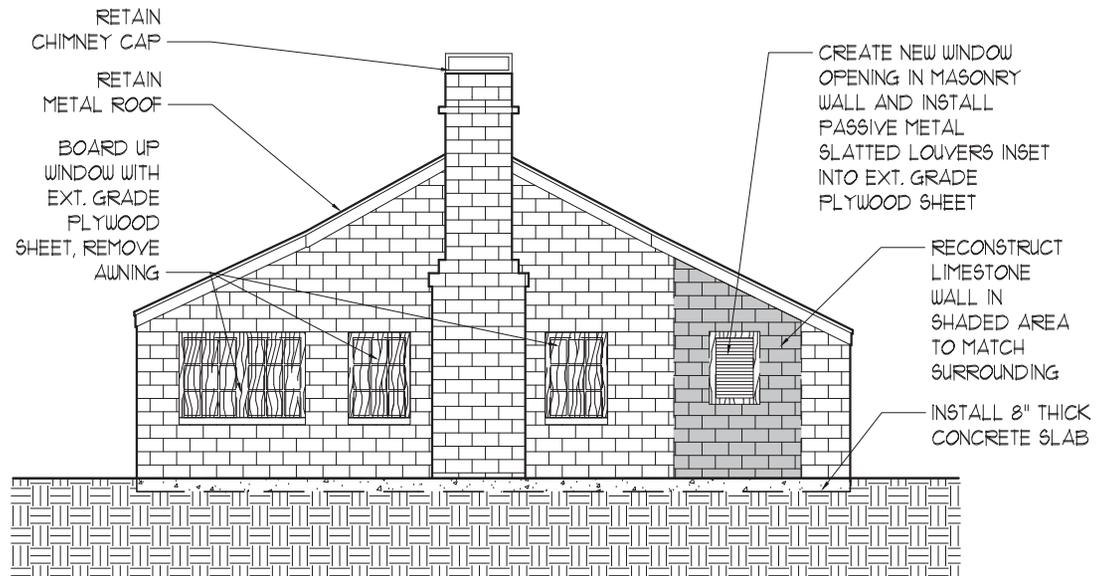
Elevations for Stabilization/Mothballing of South Elevation, after relocation to new site
